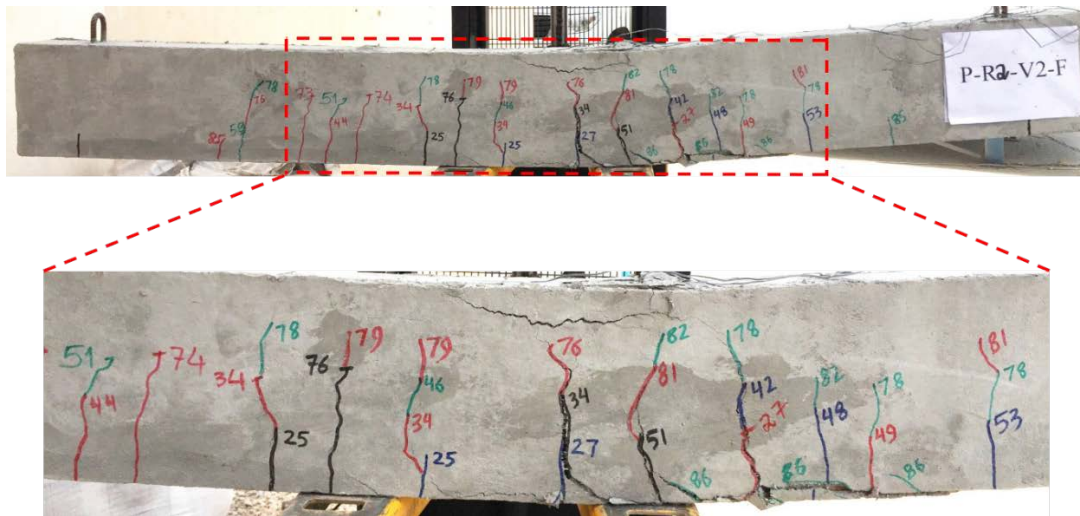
Mode of failure and crack patterns for test beam P-R2-V2-F
